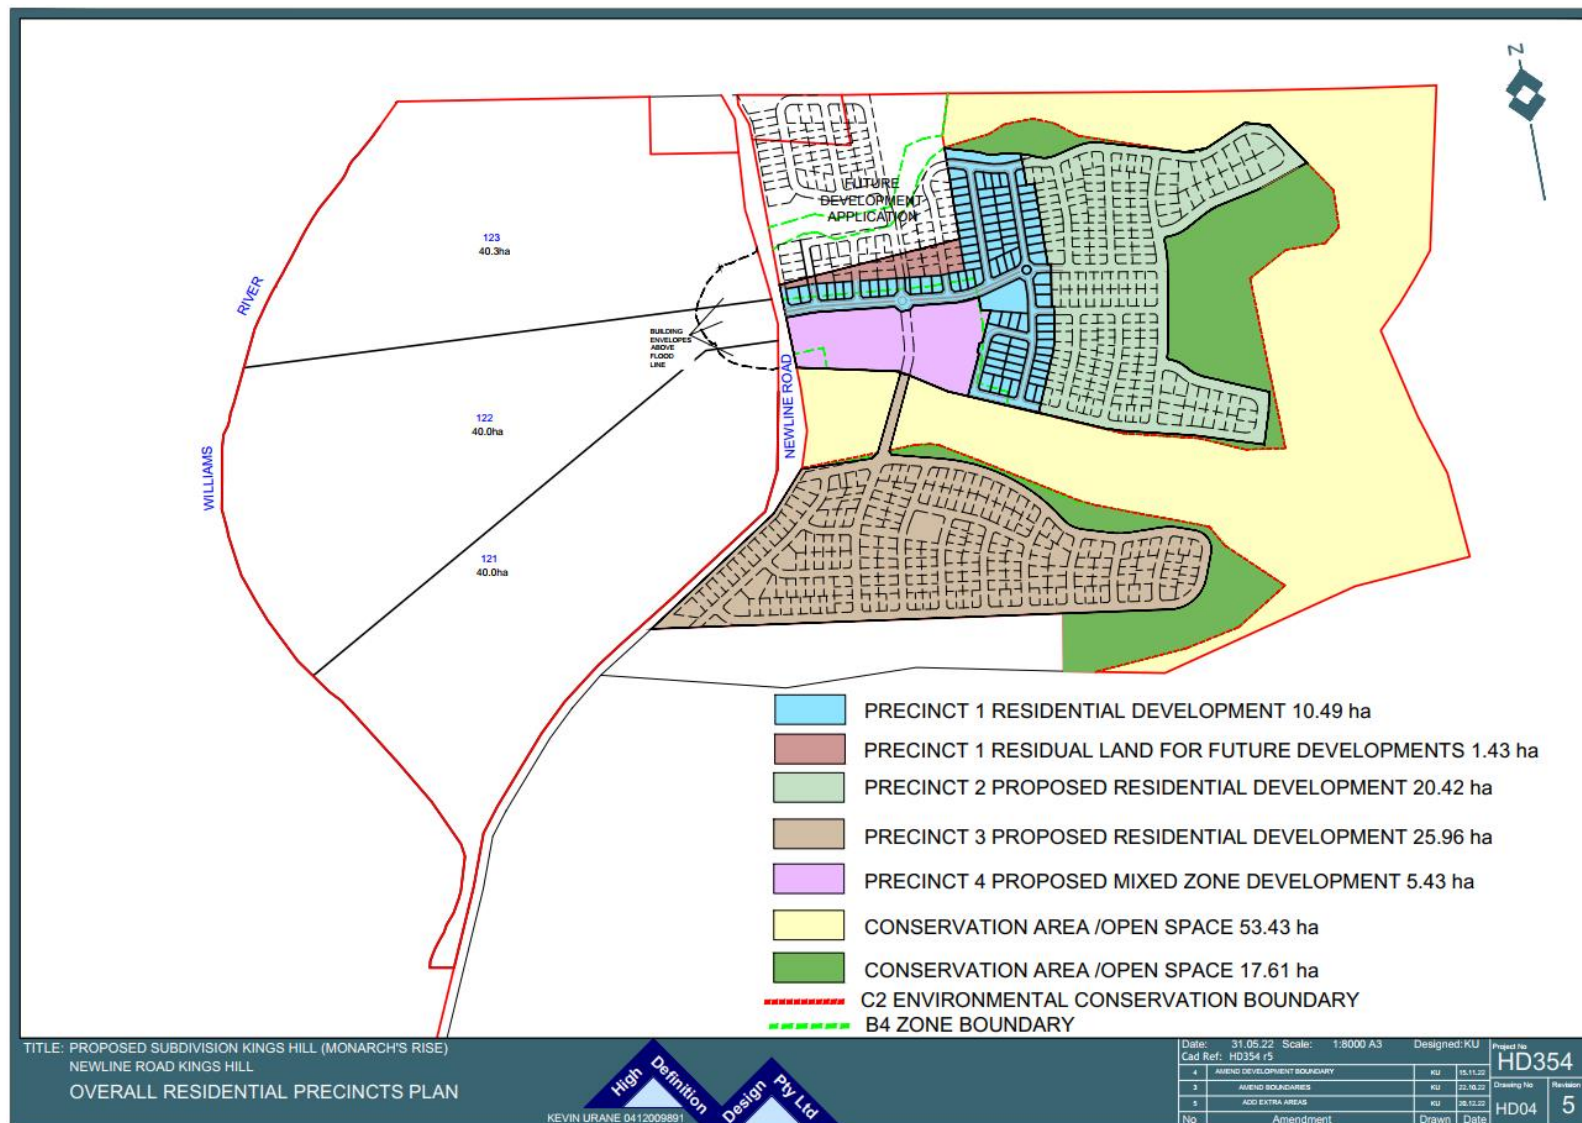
Proposed Windeyer Lands Residential Subdivision and site areas
